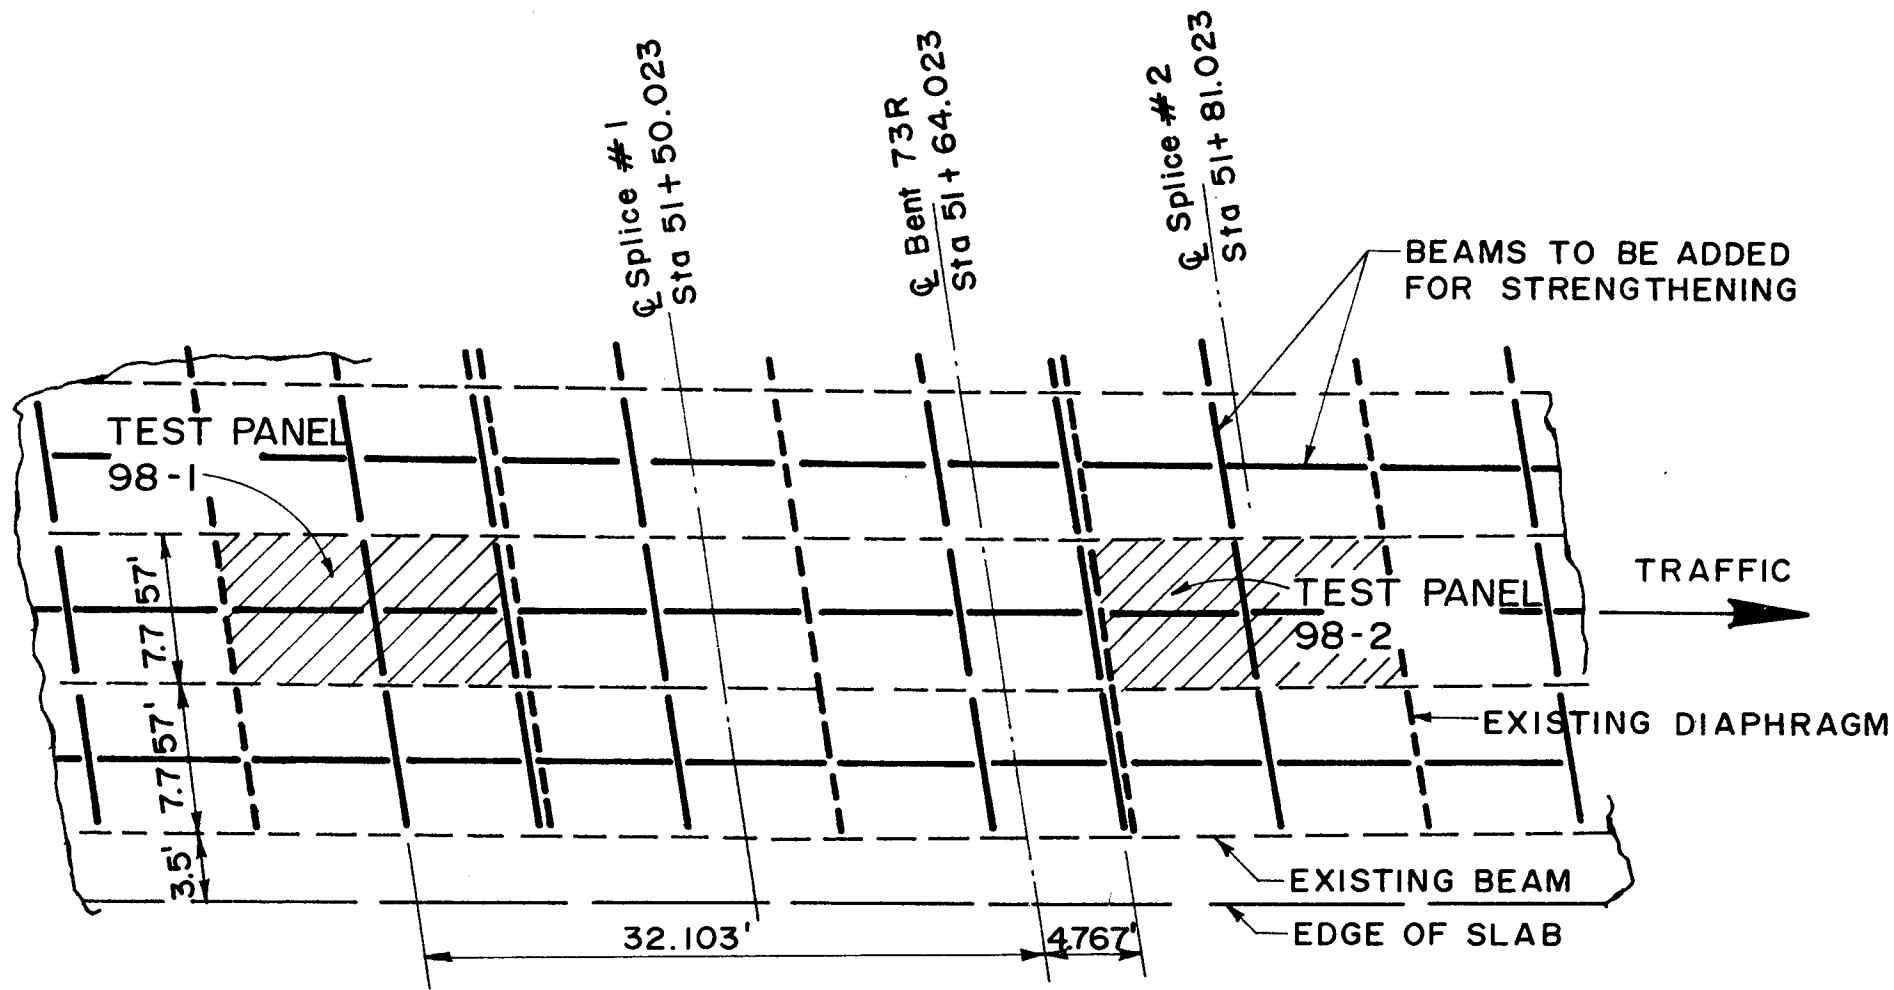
STRUCTURE 98--LOCATIONS OF TEST PANELS.
